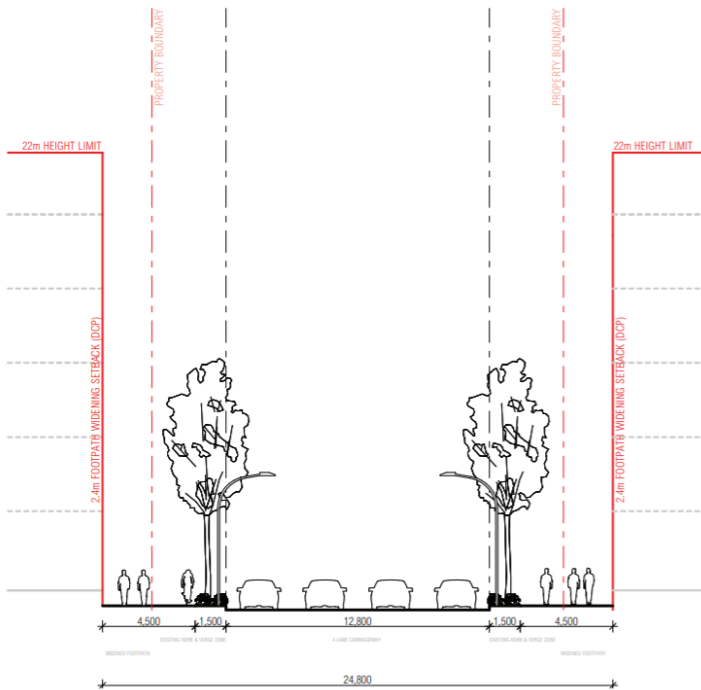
Indicative street section – O’Riordan Street (B), North Alexandria
